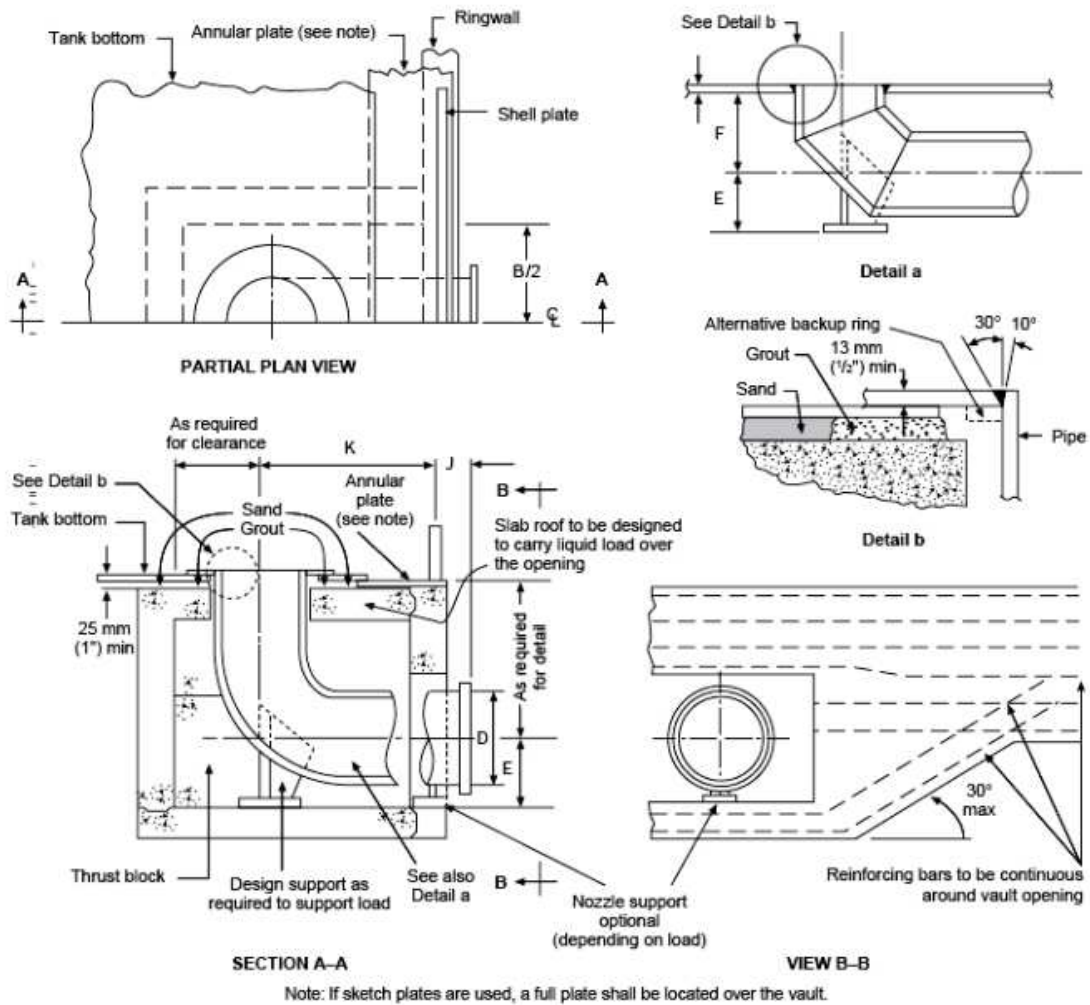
Example of Under-Bottom Connection With Concrete Ringwall Foundation and Improved Tank Bottom and Shell Support
